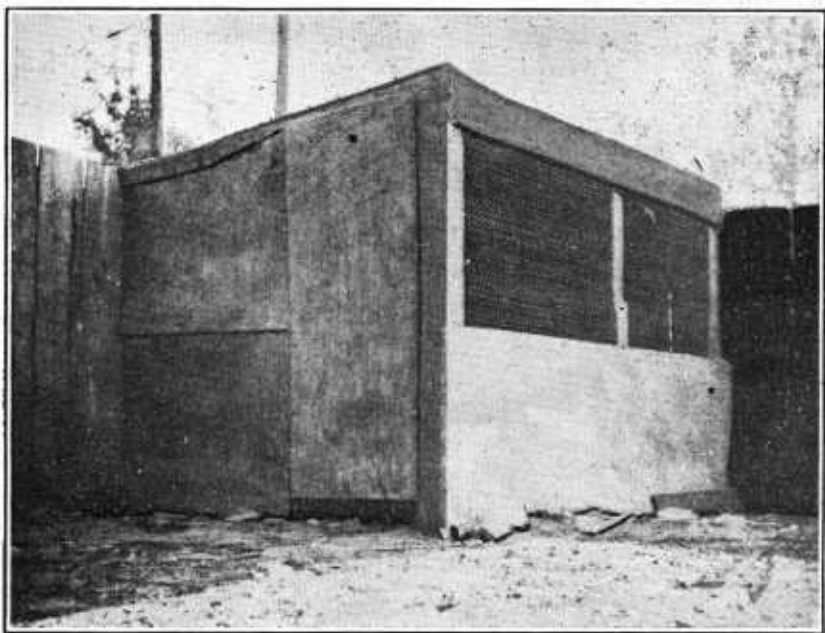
Poultry house built in the corner of a board fence, utilizing the fence for the back and one side of the house.
